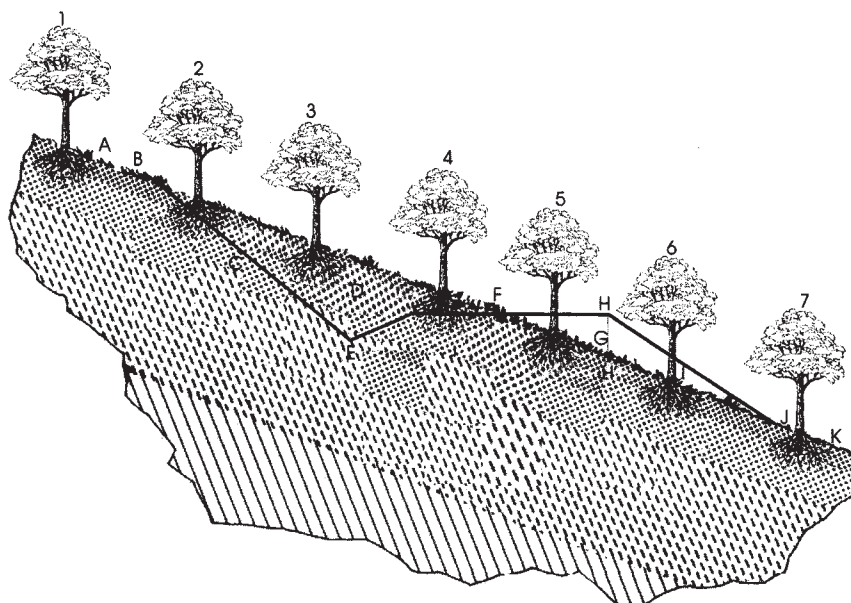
Cut and fill cross-section of a skid road/trail on a moderate slope: (A): clearing limit; (B): top of backsloped cutbank; (C): cut slope; (D): cut section; (E): ditch; (F): centerline; (G): fill section; (H-H'): outer edge and height of fill; (I): fill slope; (J): toe of fill; (K): downhill clearing limit.
